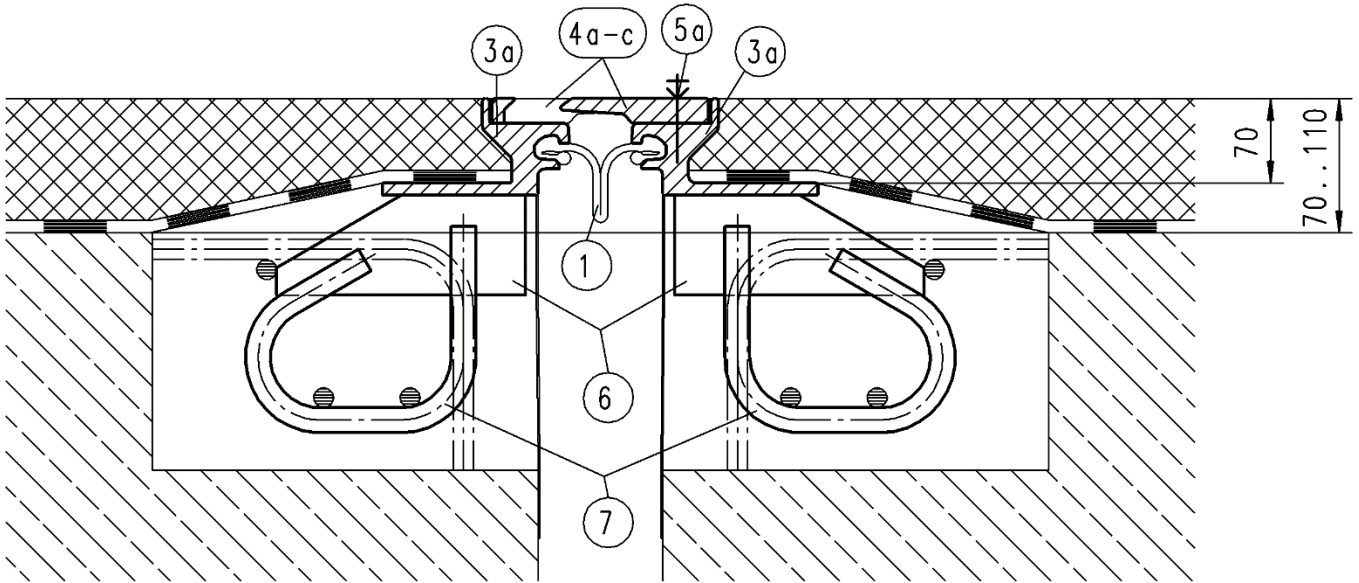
Exemplary cross section of the nosing expansion joint MAURER XC1 Expansion Joint with edge profile XC1/70 including anchorage, pavement thickness 70 mm
